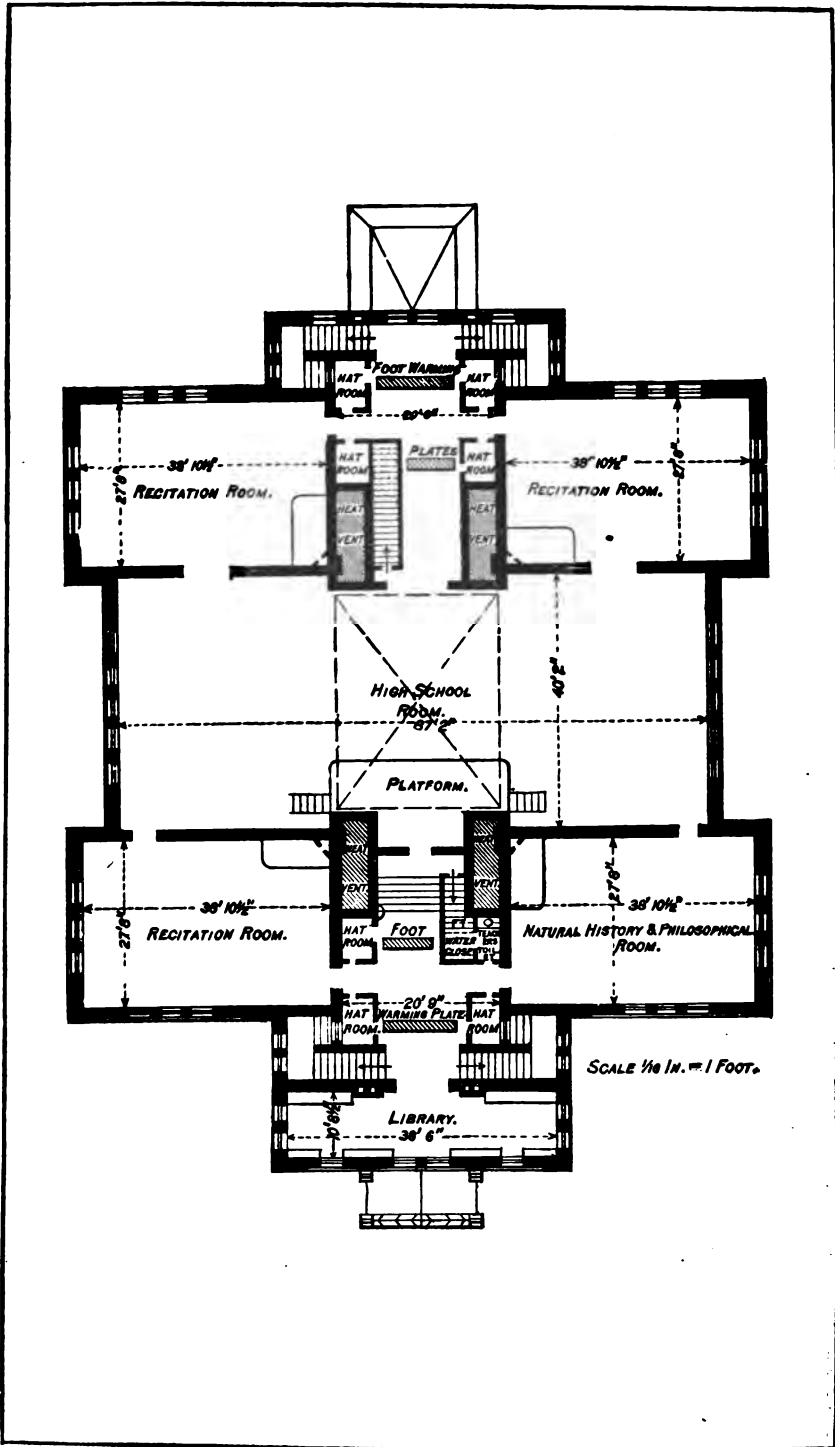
Bridgeport High School building. (Second-story plan.)
